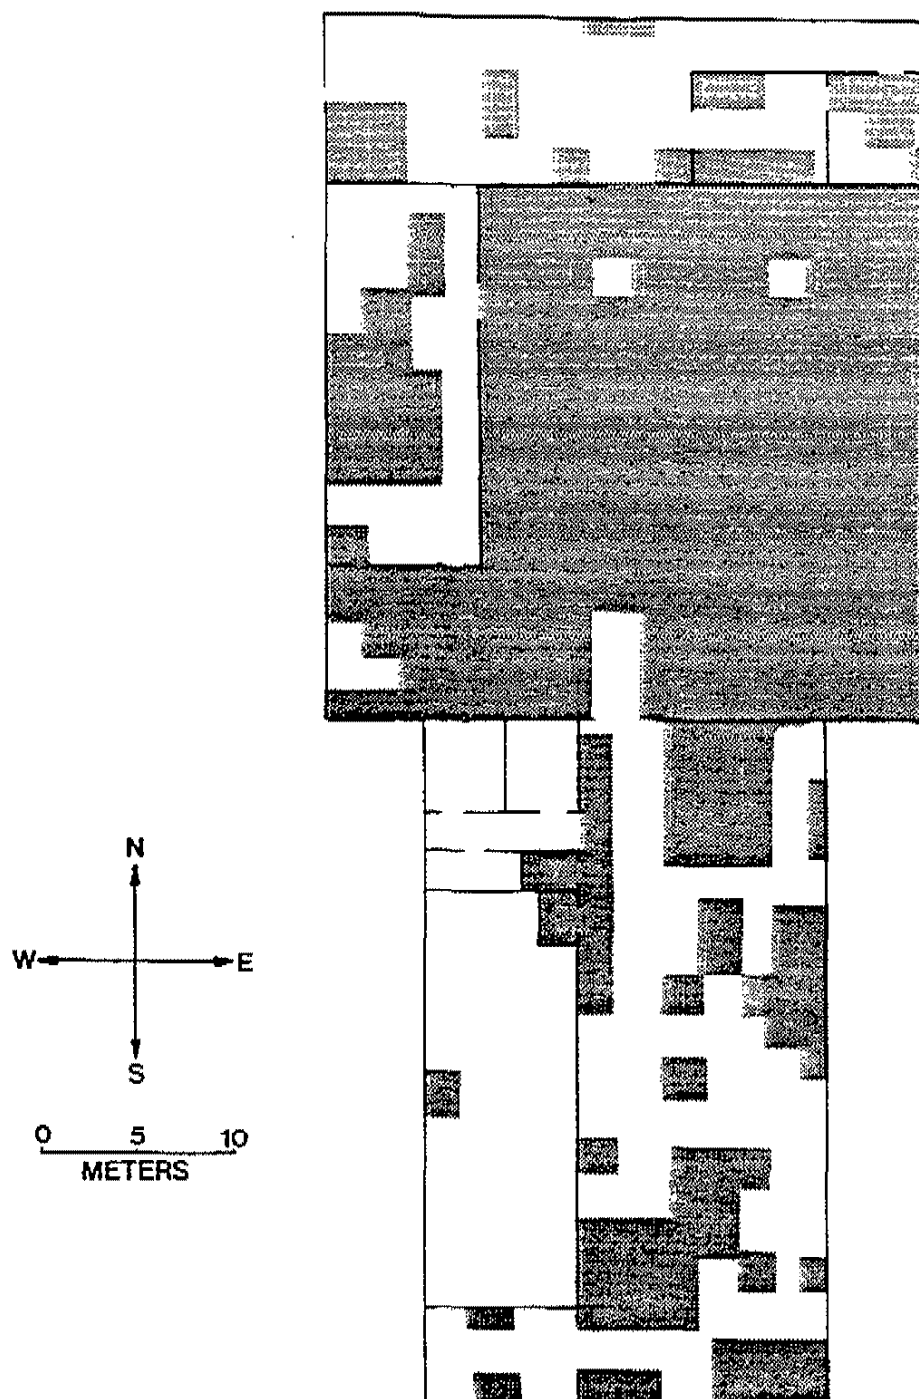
Plan of Warehouse Indicating Floor Areas (shaded) Where Contamination Exceeds Criteria.
